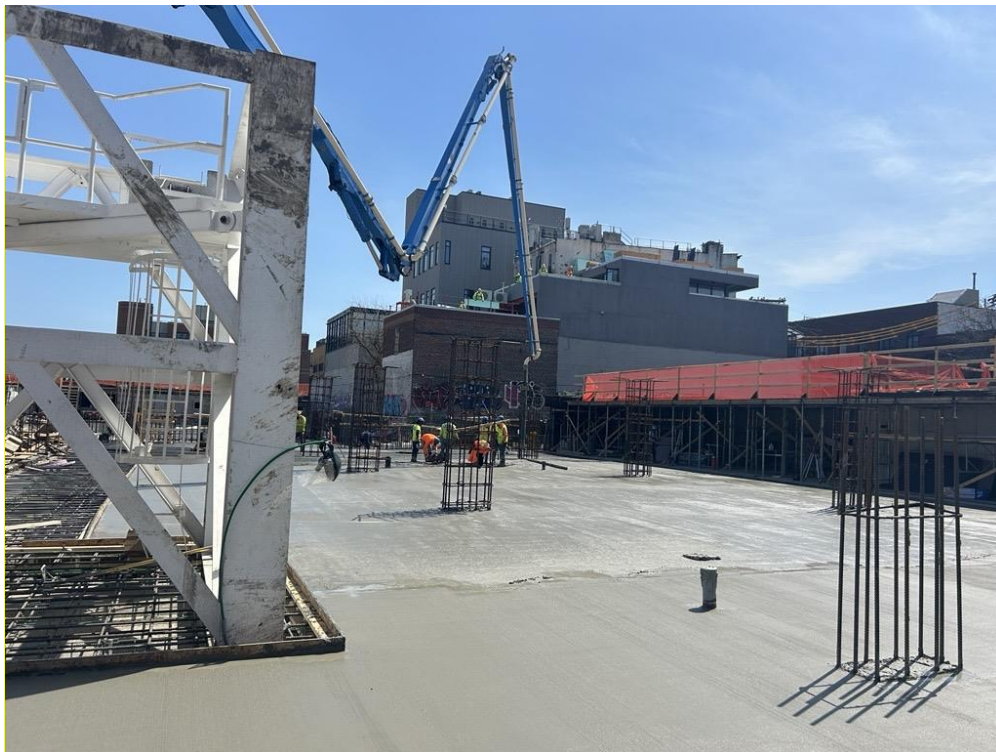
ECD pouring an about 12-inch-thick concrete slab in the central part of the site (facing southeast)
